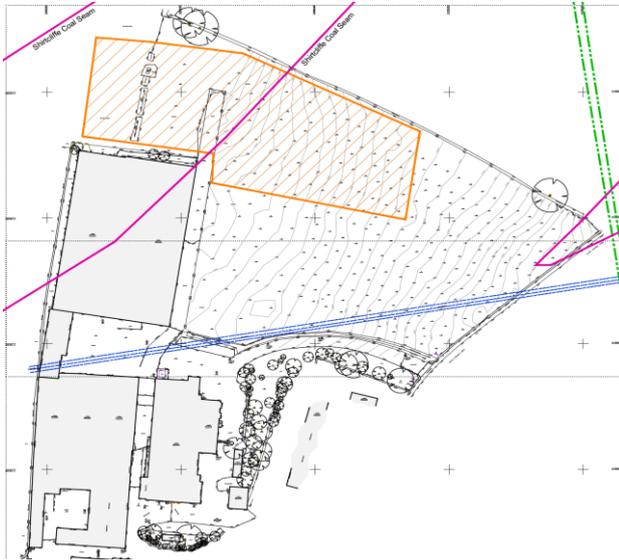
Existing Site – Land at Bark House Dairy Farm, Huddersfield Road, Shelley, HD8 8LJ.
